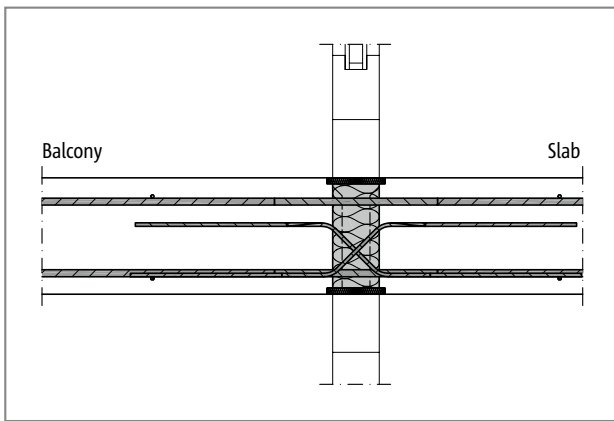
Schöck Isokorb® T type D: Installation section; one-way reinforced floor
